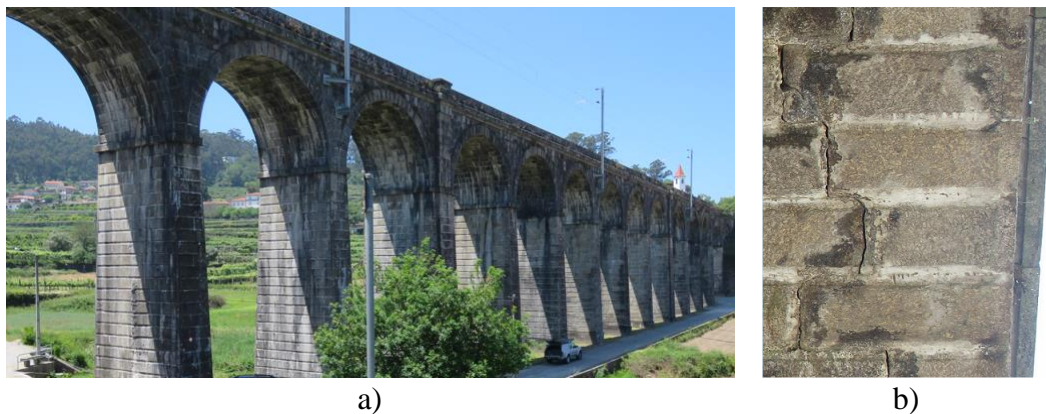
Durrães railway bridge: a) overview; b) lateral longitudinal cracks in arch A15.
